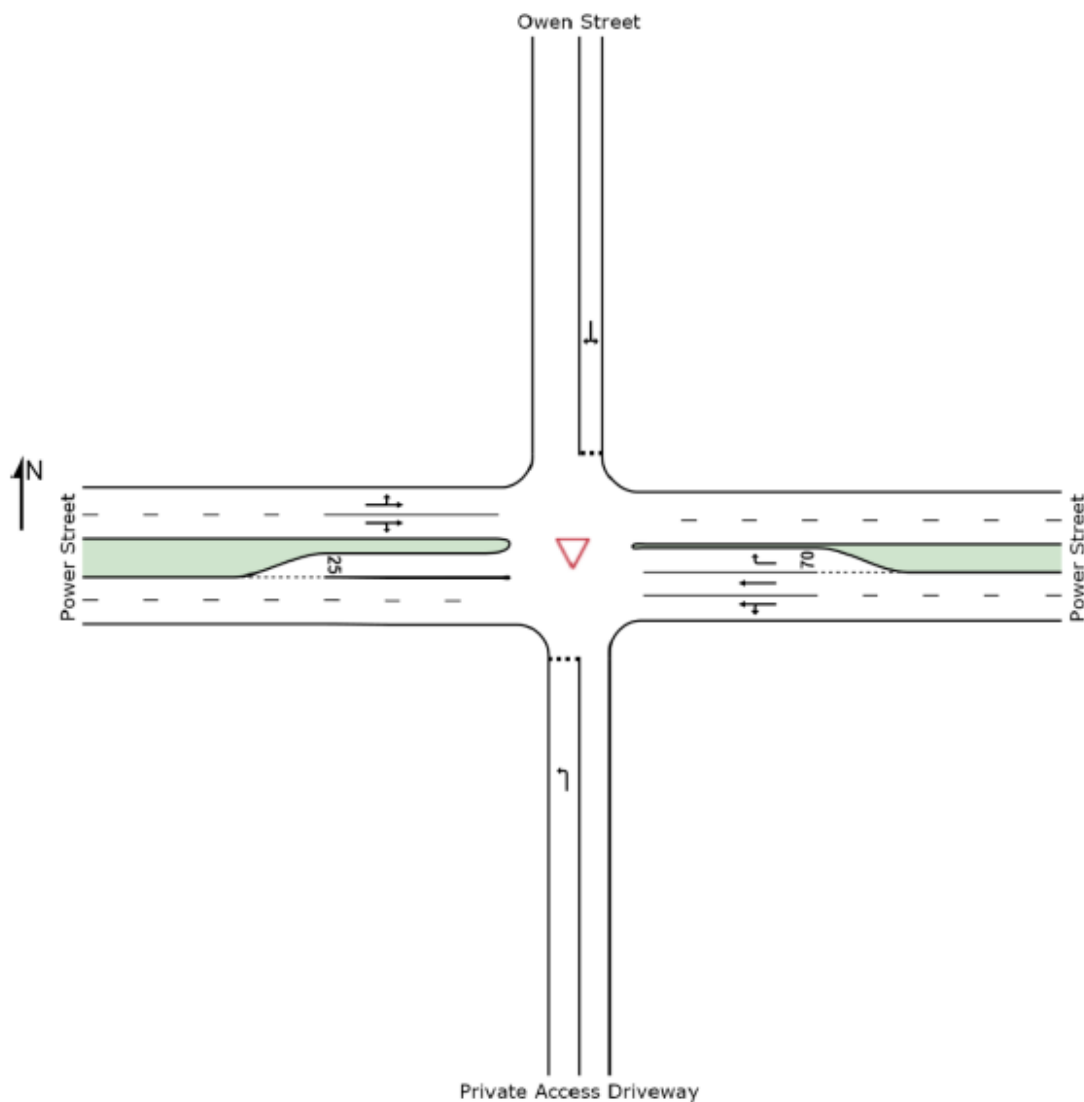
Owen Street / Power Street / private access driveway intersection layout
